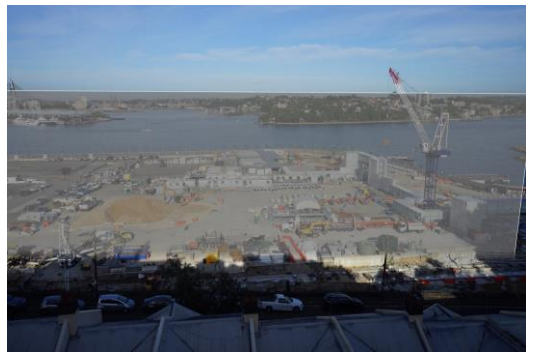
Proposed Building Envelope. Level 3 of The Langham Hotel, facing west (Source: Digital Line)
